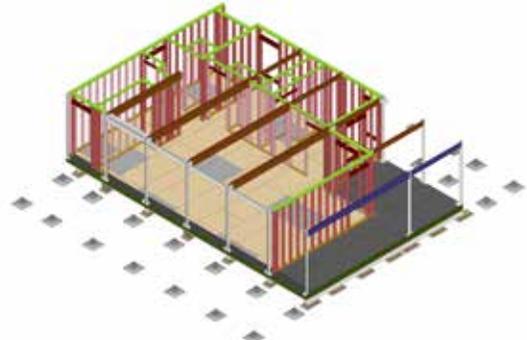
WOOD TOP PLATES + LVL ROOF BEAMS
